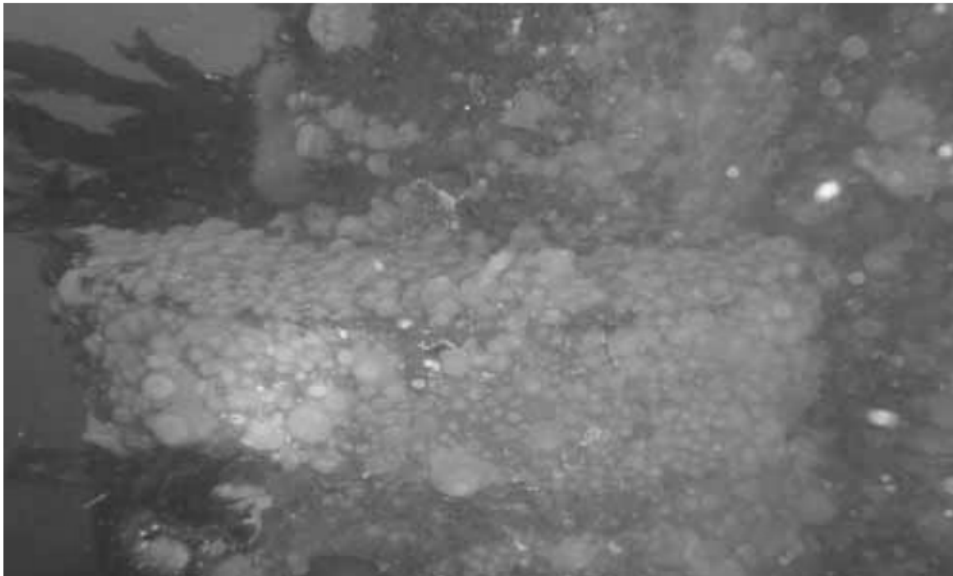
Canal Bridge No. 6880 - concrete collar on Pile No. 8 on Pier No. 8.
